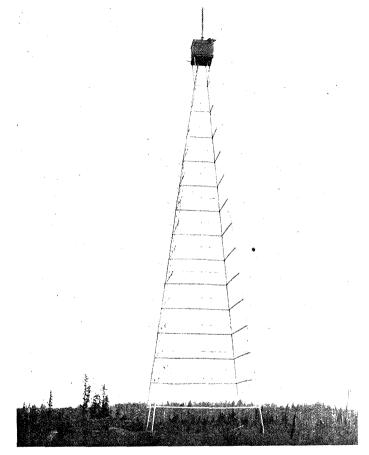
A STEEL LOOKOUT TOWER OF THE KIND USED ON THE LARGER RESERVES. (Forestry Branch Photo No. 12801.)
